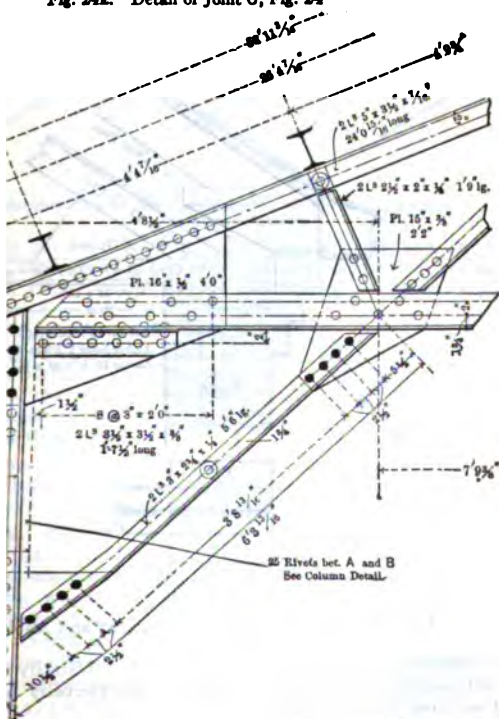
Detail of Joint 1, Fig. 55, Chapter XXVI
